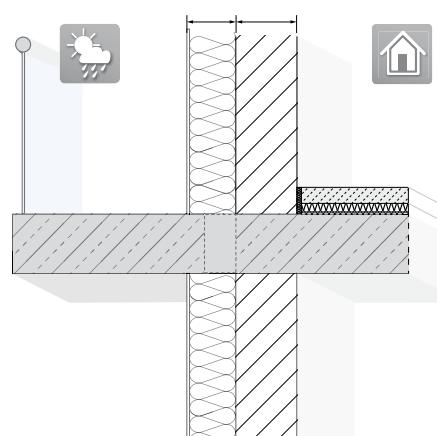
Cross section through a balcony slab with homogeneous inset, connected to the main (inner) slab.
